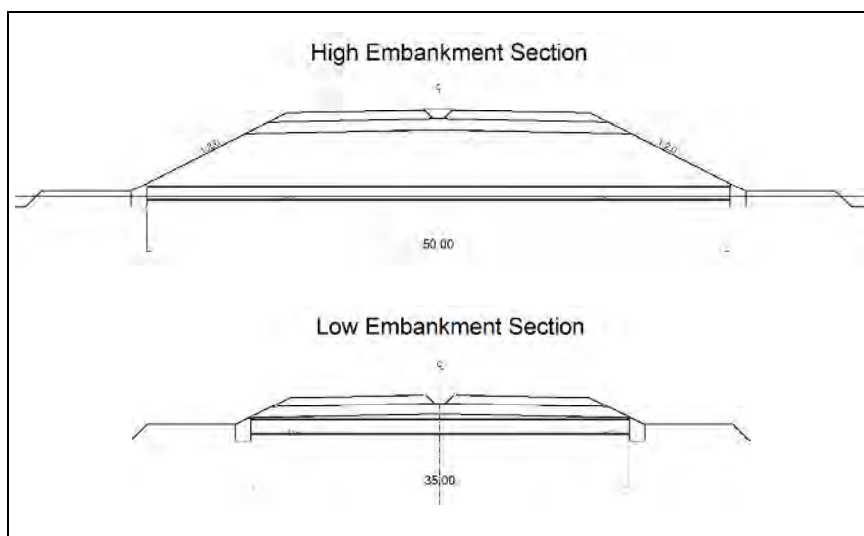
Cross Section at the Point Crossing Pipe Culvert
